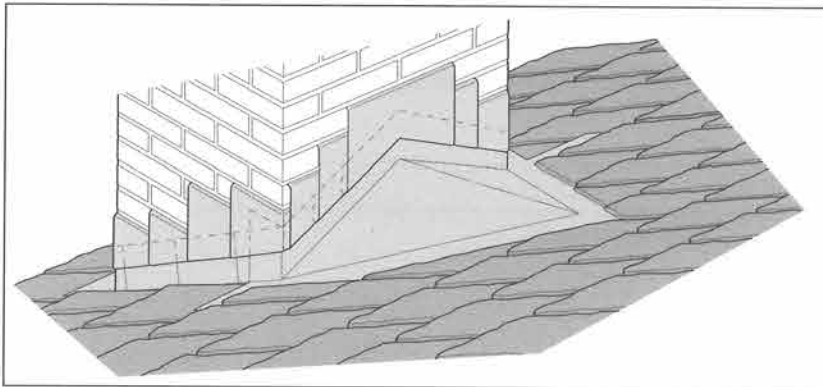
Example of a cricket flashing for the upslope portion of a masonry chimney
